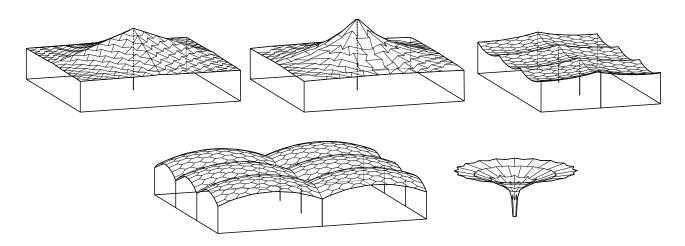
Examples of ways a shell can meet a corner of an existing building, including a solution used by Almegaard (bottom right). The configurations on the bottom row require a diagonal beam to be placed in the corner.
